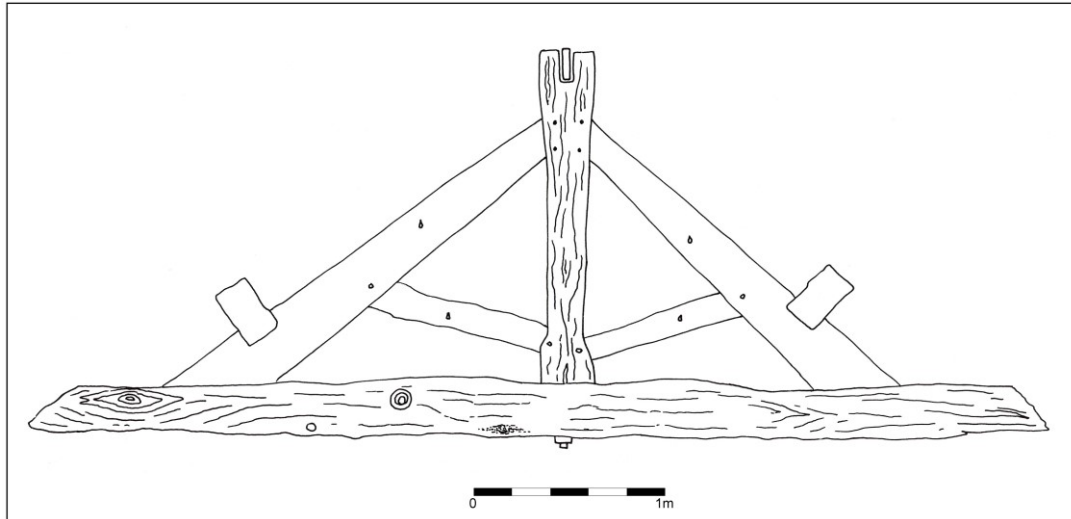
Cross-section of mid-19th century kingpost roof truss in first floor of outbuilding range
